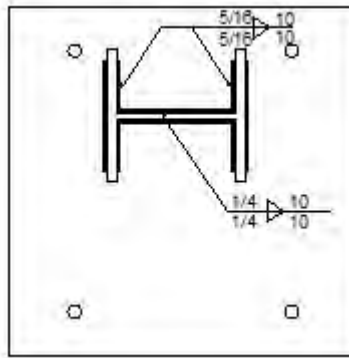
Fillet welds between the W-section and the base plate
